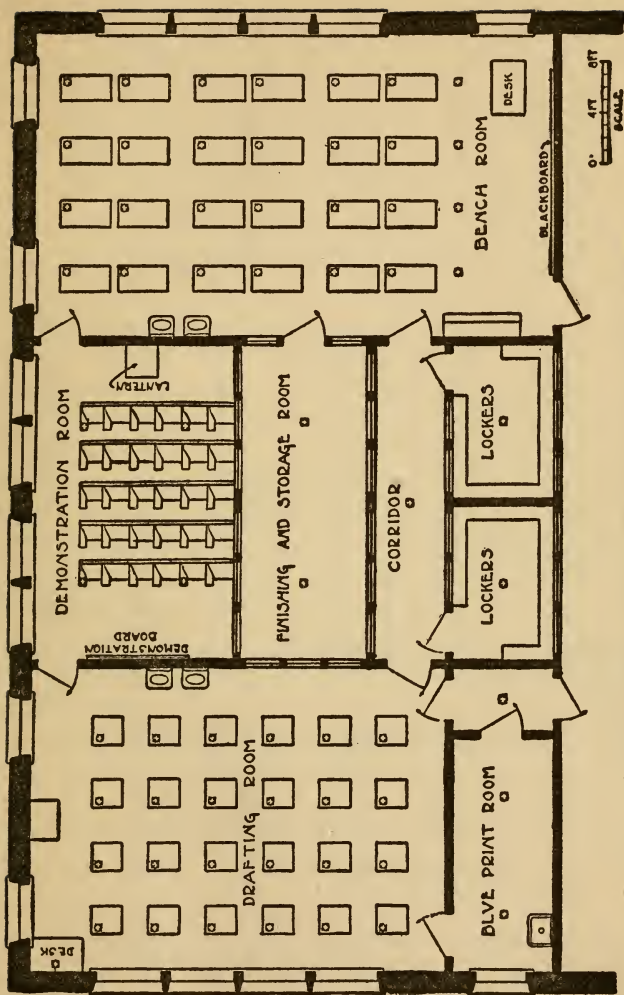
TYPICAL MANUAL-TRAINING DEPARTMENT ROOMS
